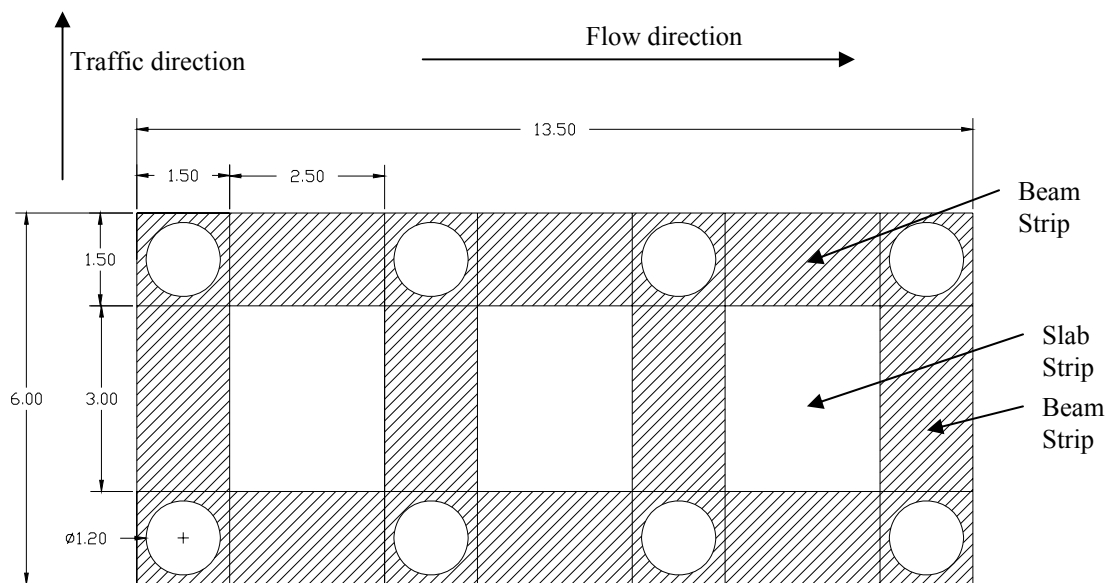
FORMATIONS OF STRIPS FOR PILE CAP
